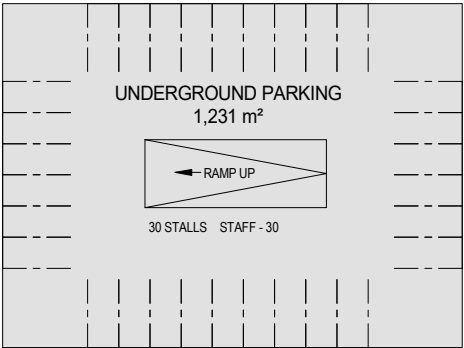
1903 Mt Newton Cross Road Site Concept: Site Distribution Concept 1
